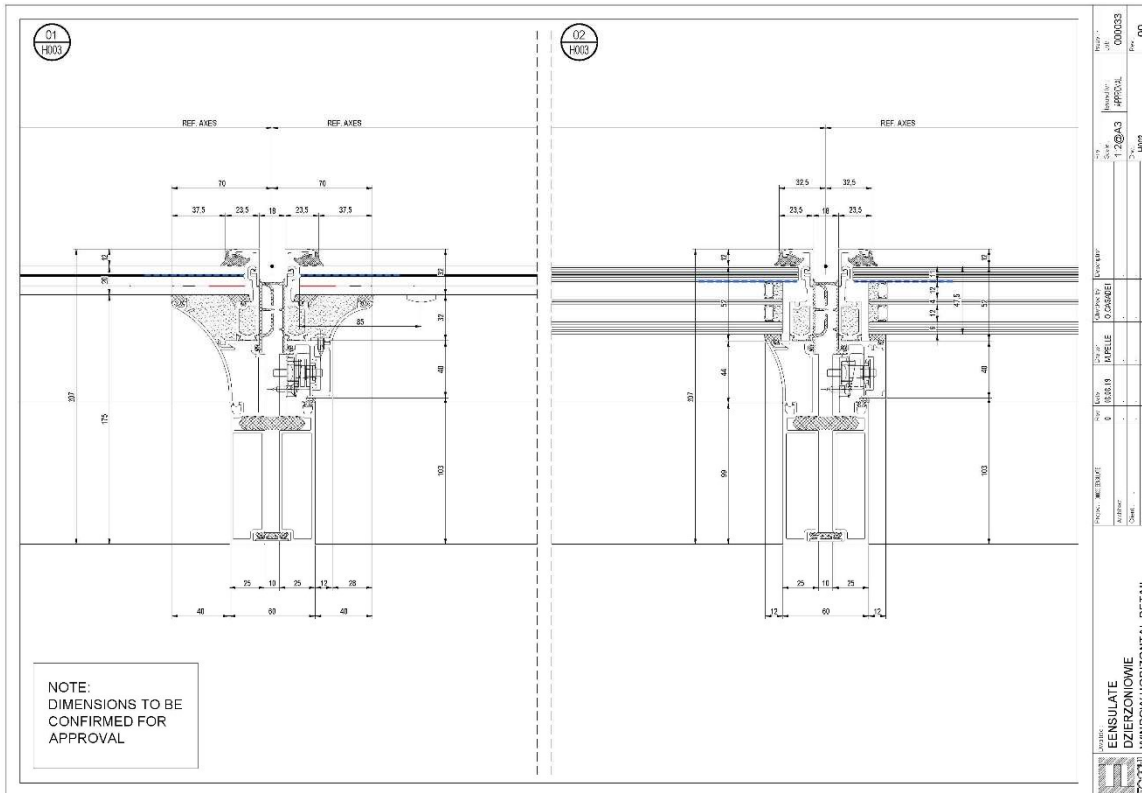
Polish Primary School: Curtain wall detail 3 (window horizontal detail)
